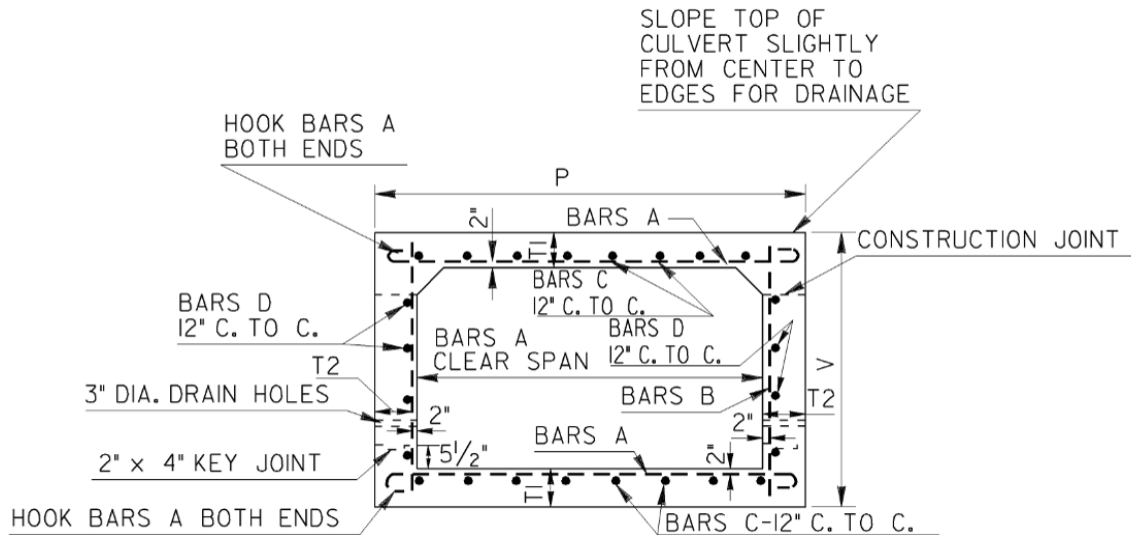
GDOT Single Barrel Cast-in-Place Box Culvert Cross Section Example (GDOT 2001a)
